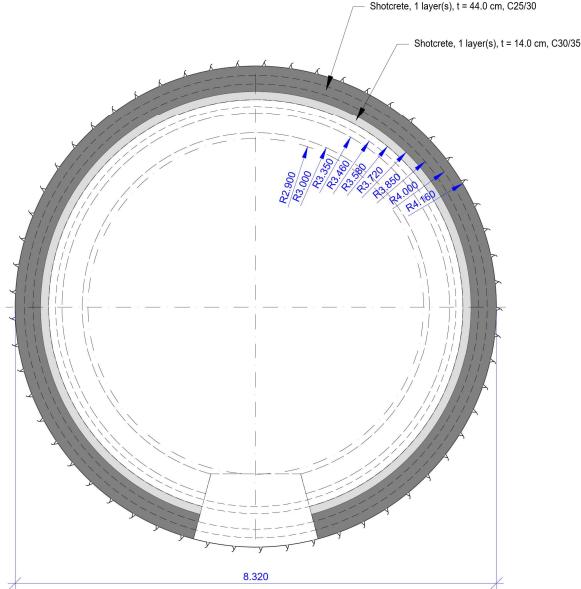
Cross section output on drawing – Shotcrete with invert tubing in shotcrete SCT1 and SCT2
